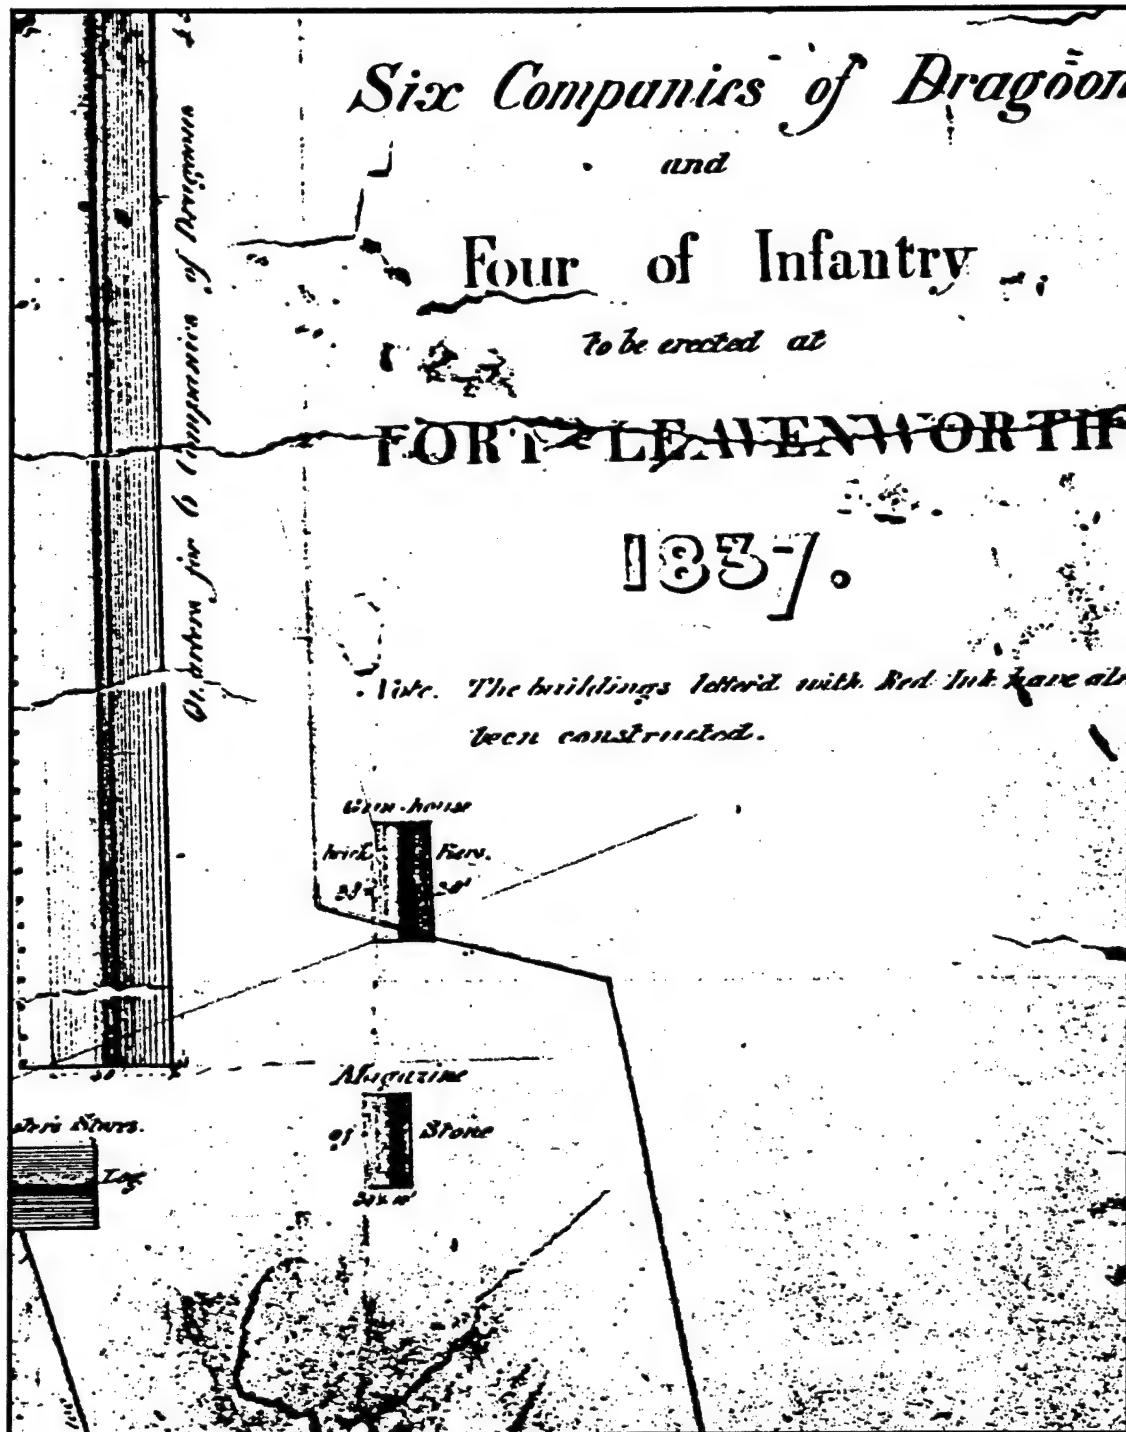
1837 map of southeast corner of Main Parade showing gun house, magazine, and proposed location of dragoon barracks.
